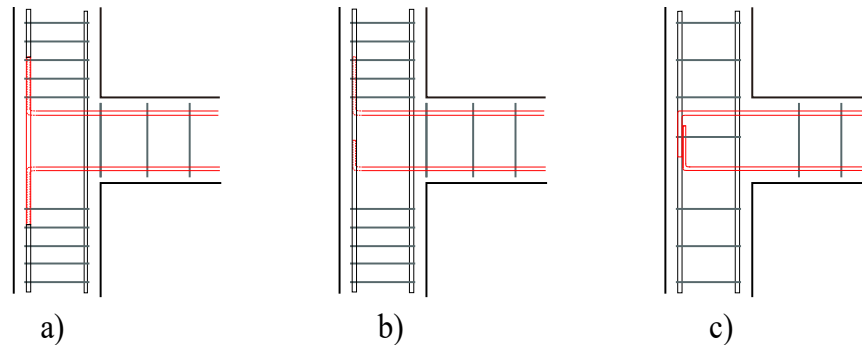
Types of anchorage in BCJs a) Beam bars bent away from joint core, b) Tension beam bars bent away from the joint and compression beam bars bent in the joint core, c) Beam bars bent in the joint.
